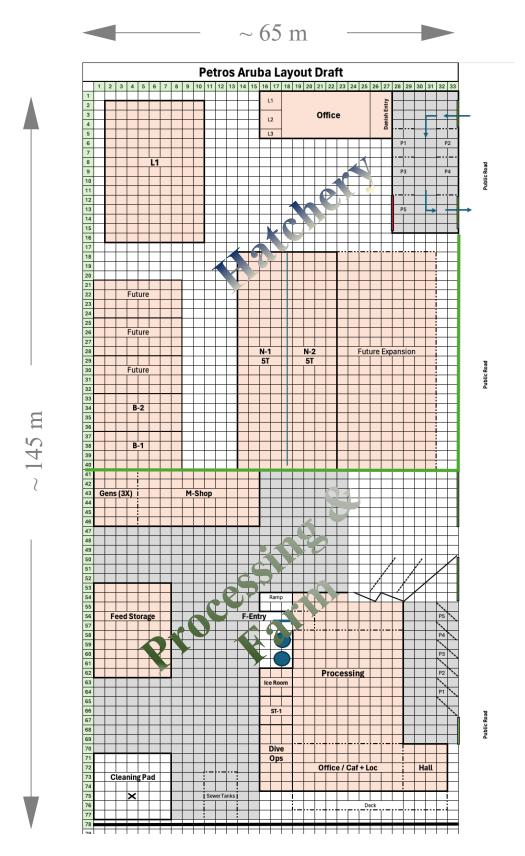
Petros Proposed Layout (Details in Appendix 9)
